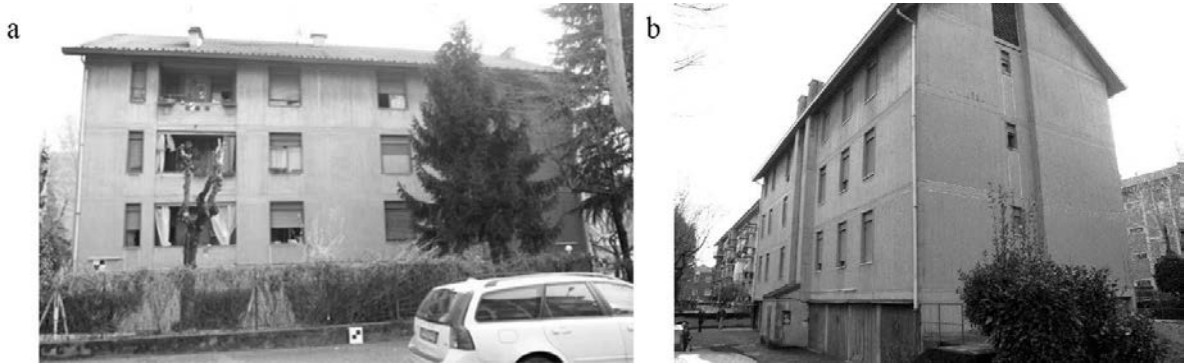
a) south façade of the multistory building; b) north-west corner.
